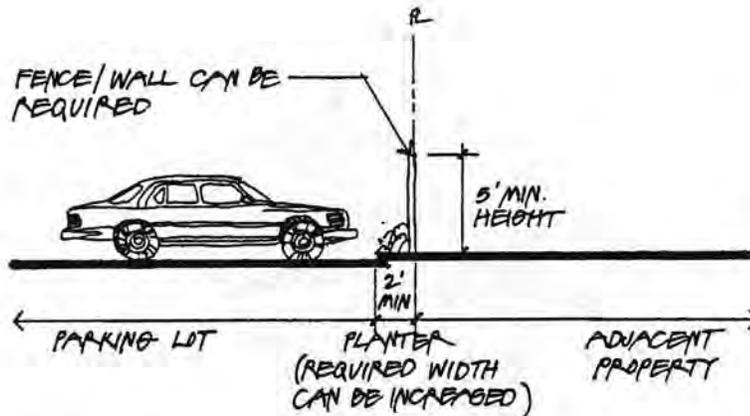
PARKING LOT EDGE CONDITION—FENCE OR WALL
